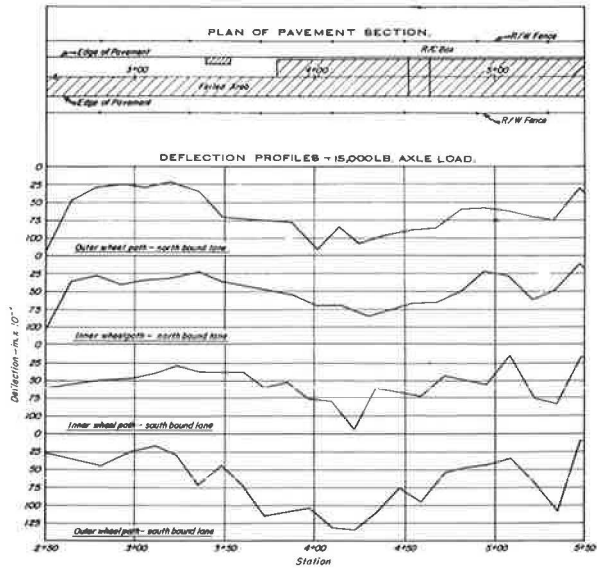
Typical deflection profile—high deflection area section 4-W-1.
